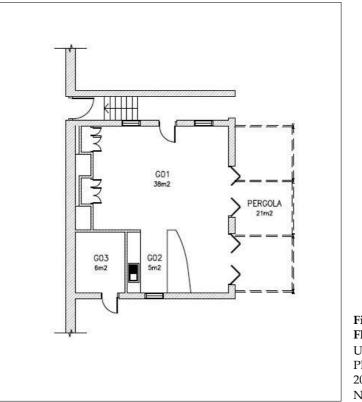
Floor Plan. UNSW Information Services. Plan last modified Setpember 2010. Note: there is no pergola.
